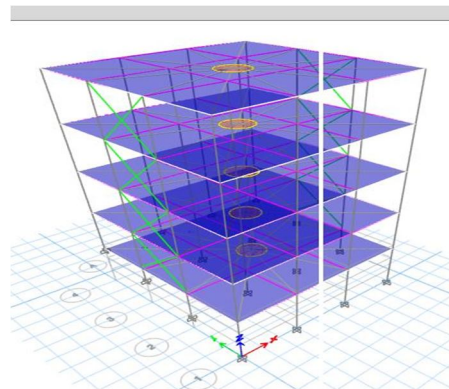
Model 2: G+4 Building With X- Bracings at 20° Slope
